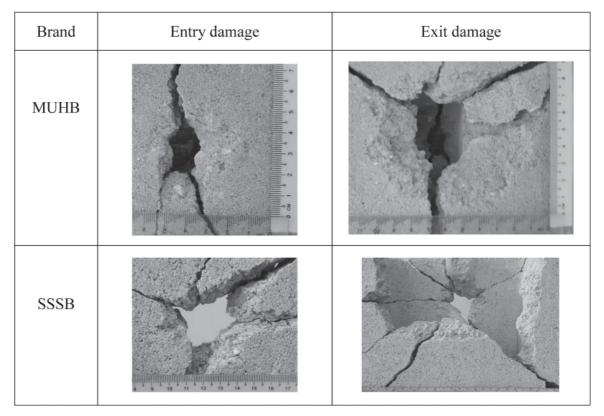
The size and shape of entry and exit damages of 2 holes hollow block manufacture at 30m by using 7.62 mm Rifle.
